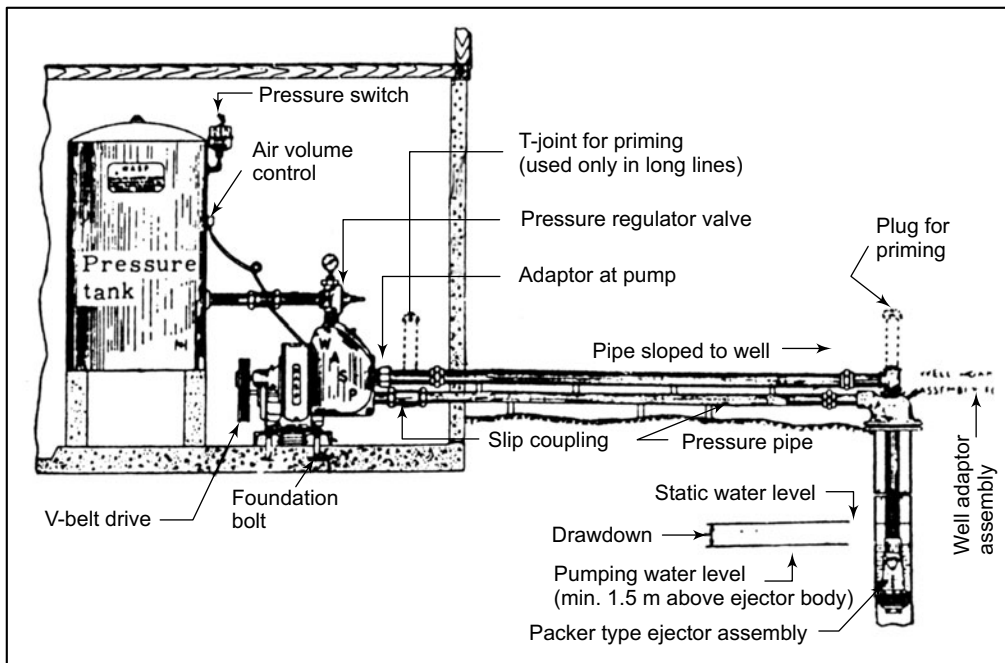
Details of installation of jet pump equipped with packer-type ejector assembly and pressure tank in a shallow tube well
